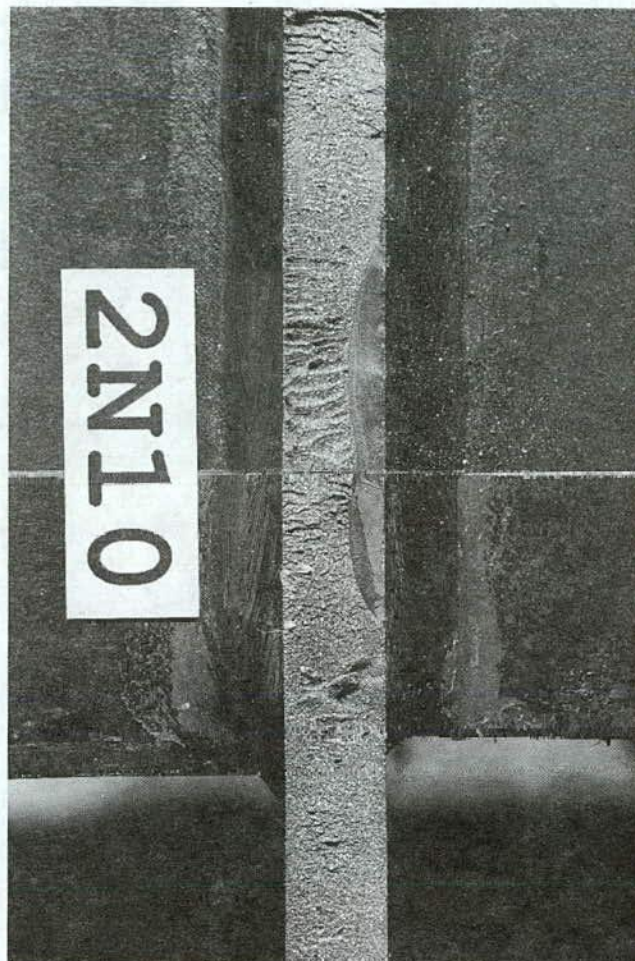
Fatigue crack at detail 10, Girder 2N.
